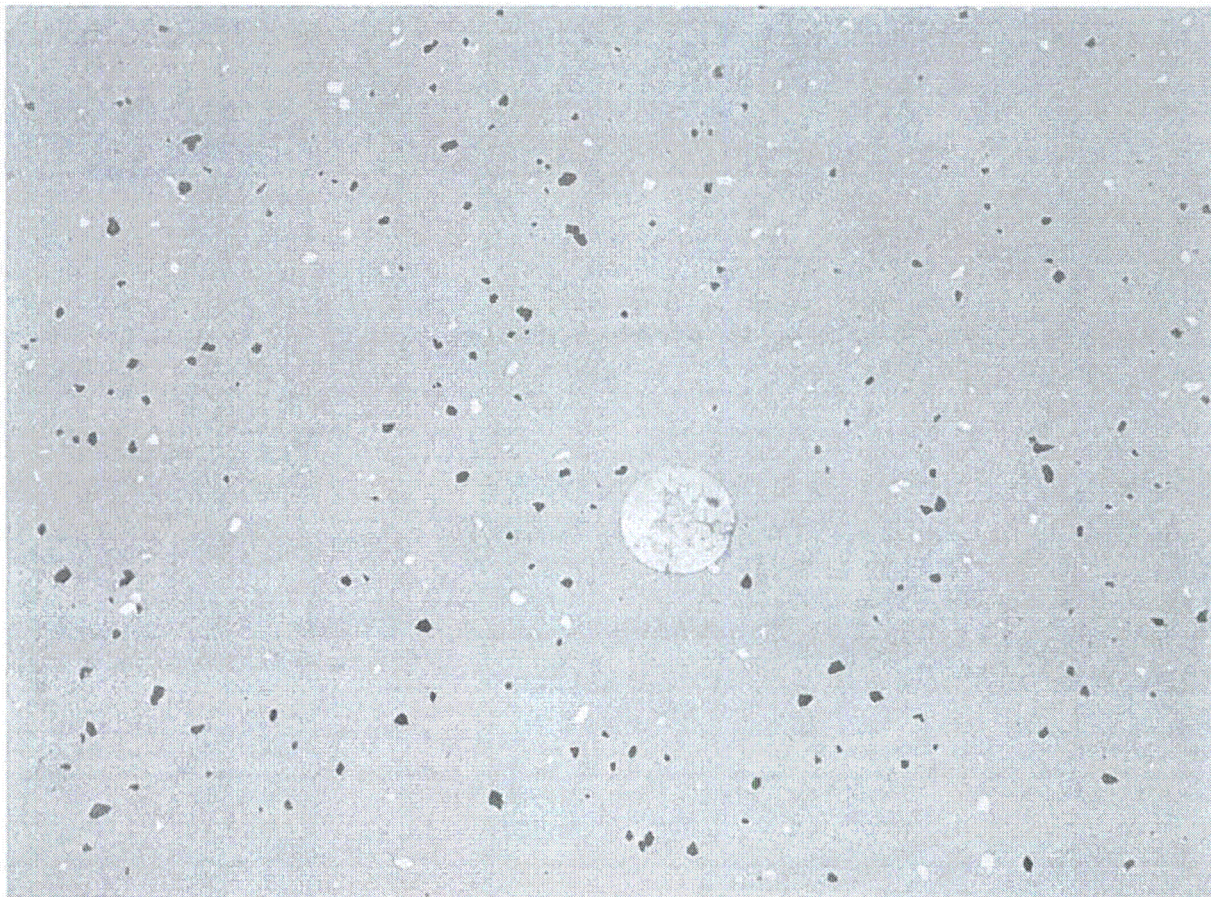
Equipment Tag on Floor at 130' Elevation of the Reactor Building
